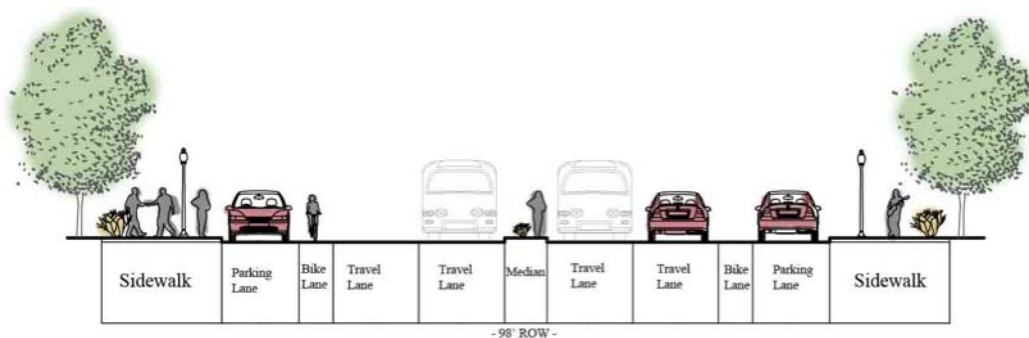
Section describing street improvements to Michigan Avenue (De Silva 2010)
